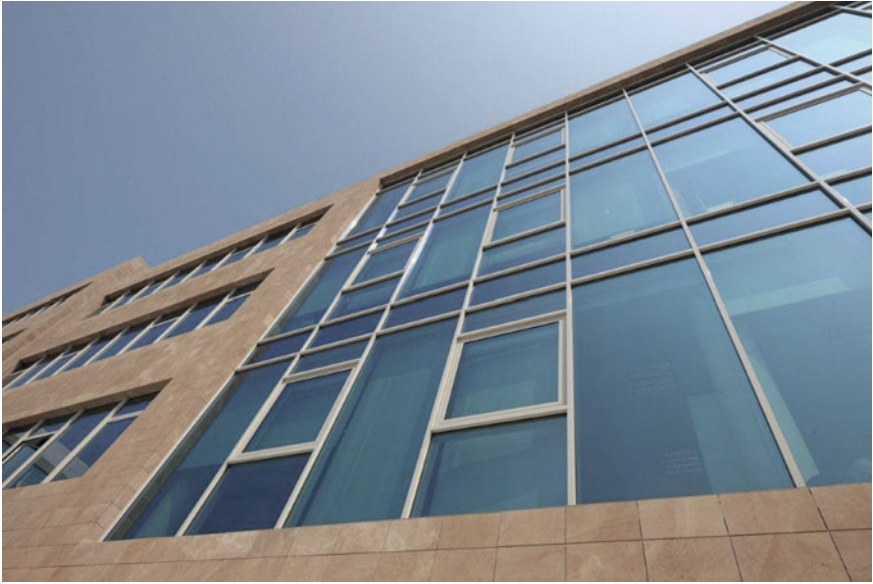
Studio Bertonazzi Associati, *Metrocomplex*, Milan. Articulated modulation of the façade surface within the stone cladding curtain wall section, aimed at rooting with the urban context. © Courtesy of Schüco
